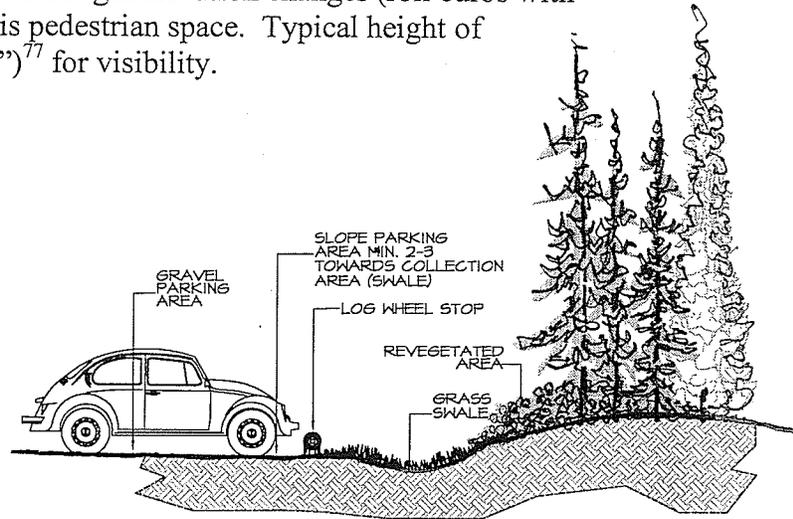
Section of parking stall with shrubs and setback, M. Mitchell
